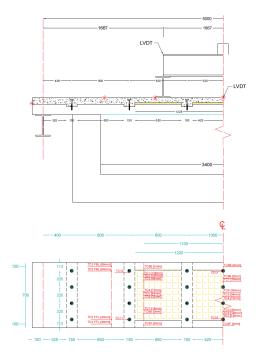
A general test setup with a typical TCC floor test assembly with strip notch connections and thermocouples layout
